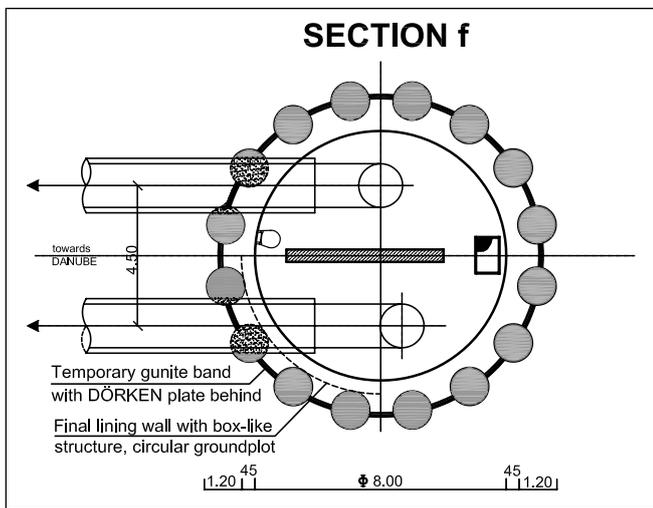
Horizontal section (f) of the structure "A" (final status)
